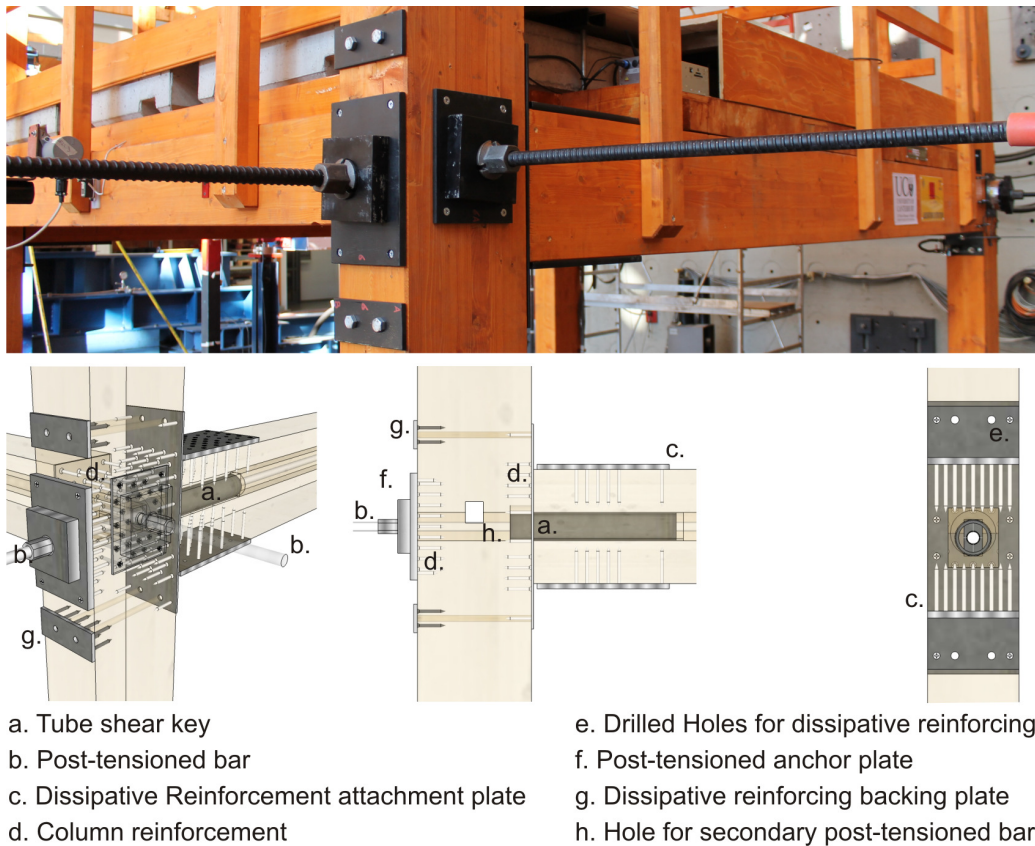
Beam-column connection used in 2/3rd scale, 3-storey dynamic test frame
